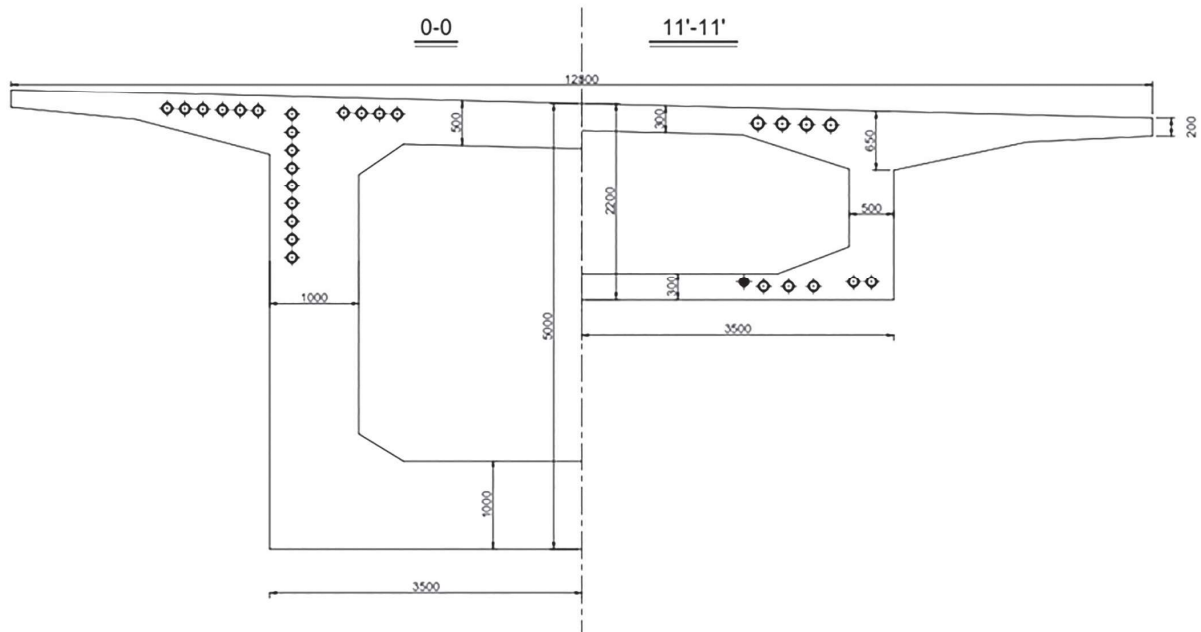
Half cross section of box girder at pier top and mid span (unit: mm).
